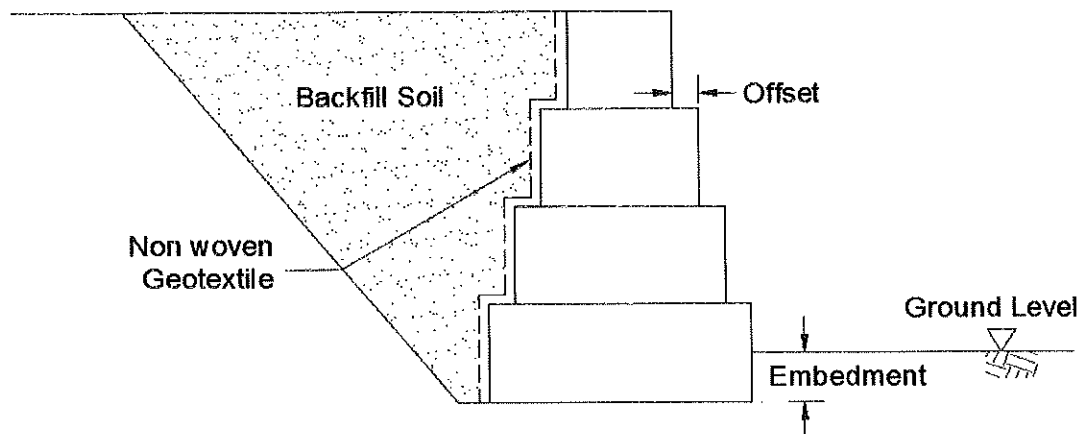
Typical Cross Sections of Gabion Wall with Offset
